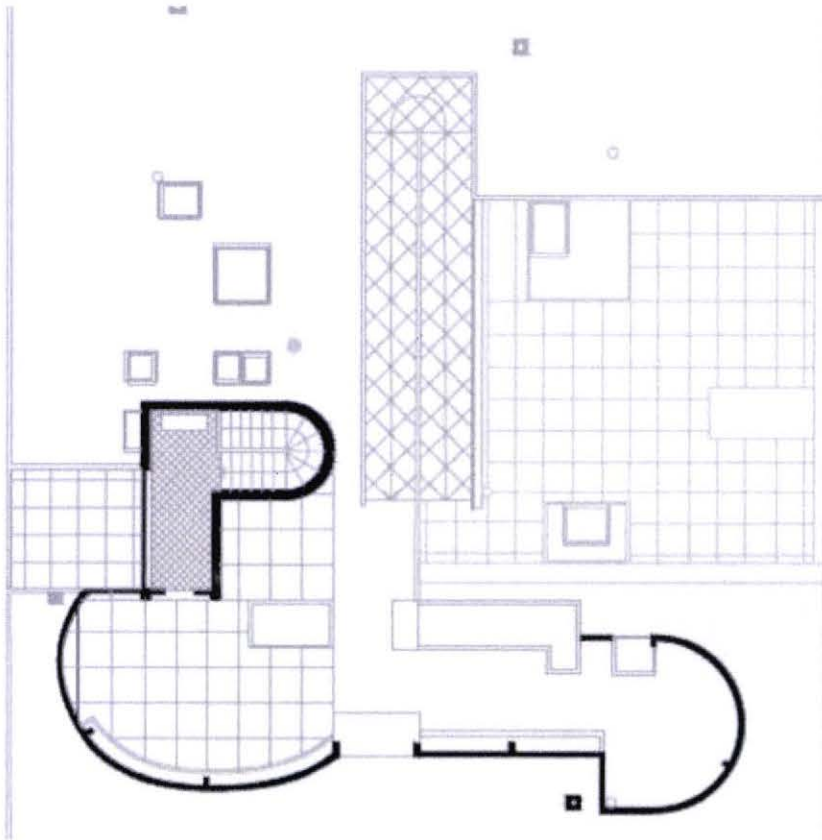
, Villa Savoye floor plan. Source: Friv 5.
